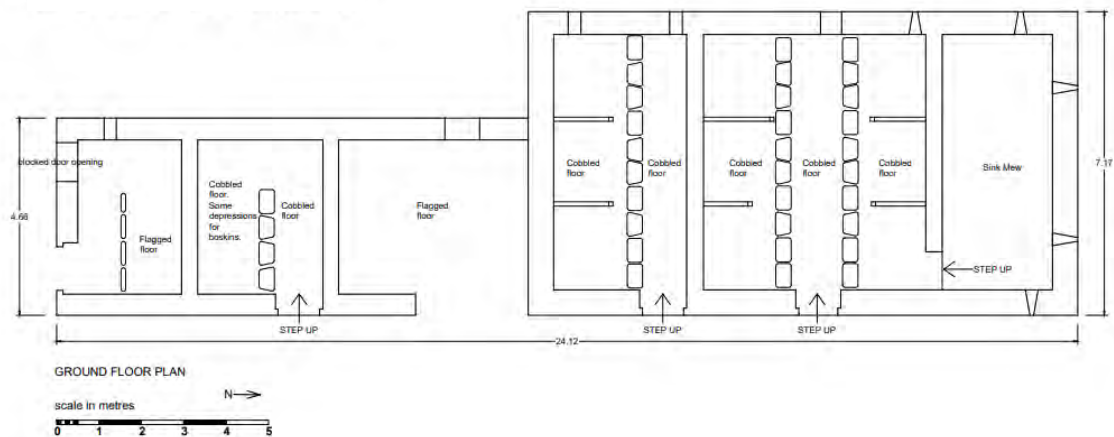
The ground floor plan of a bank barn on a farmstead, drawn by Lynne Seignot
